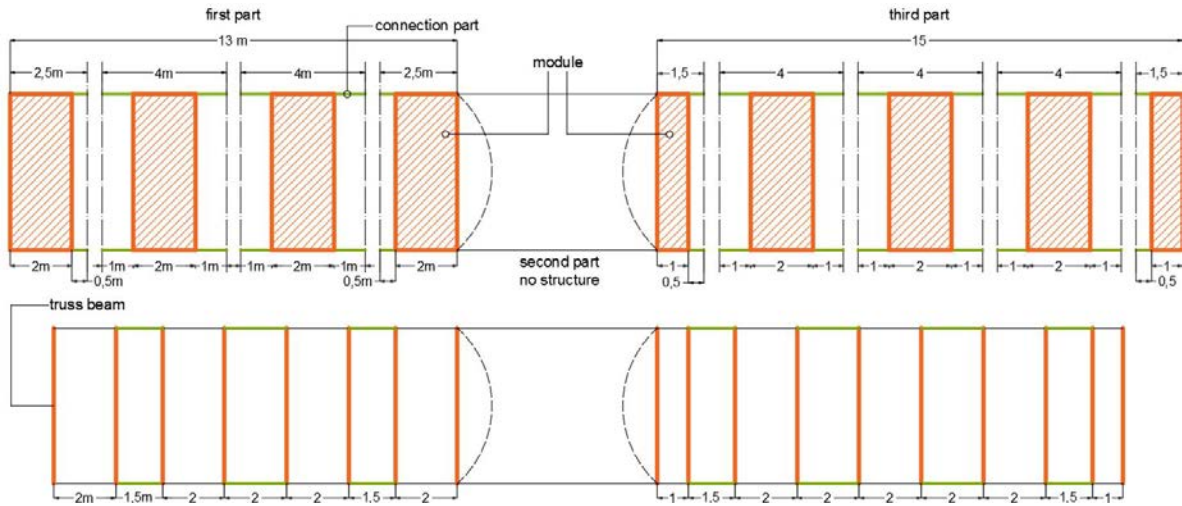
Modular steel truss deck adopted for the restoration design of the “Galleria delle volte crollate”: plan view of the several prefabricated modules assemblage *in situ*.
